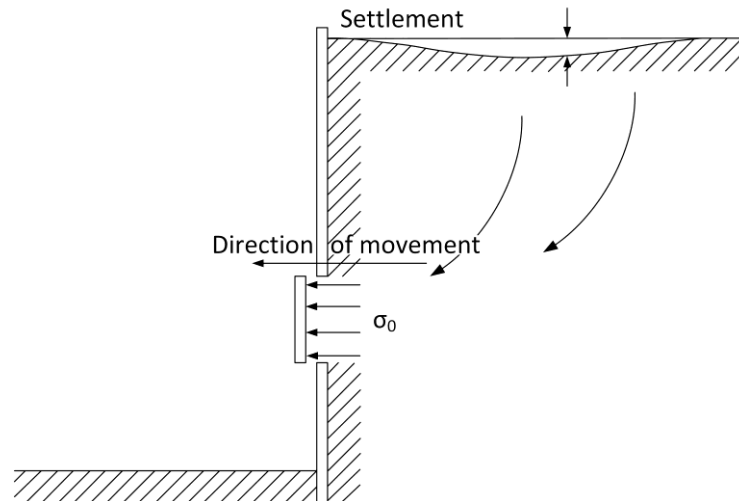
Layout of a circular opening in the vertical sheet pile wall (Broms & Bennermark, 1967)
